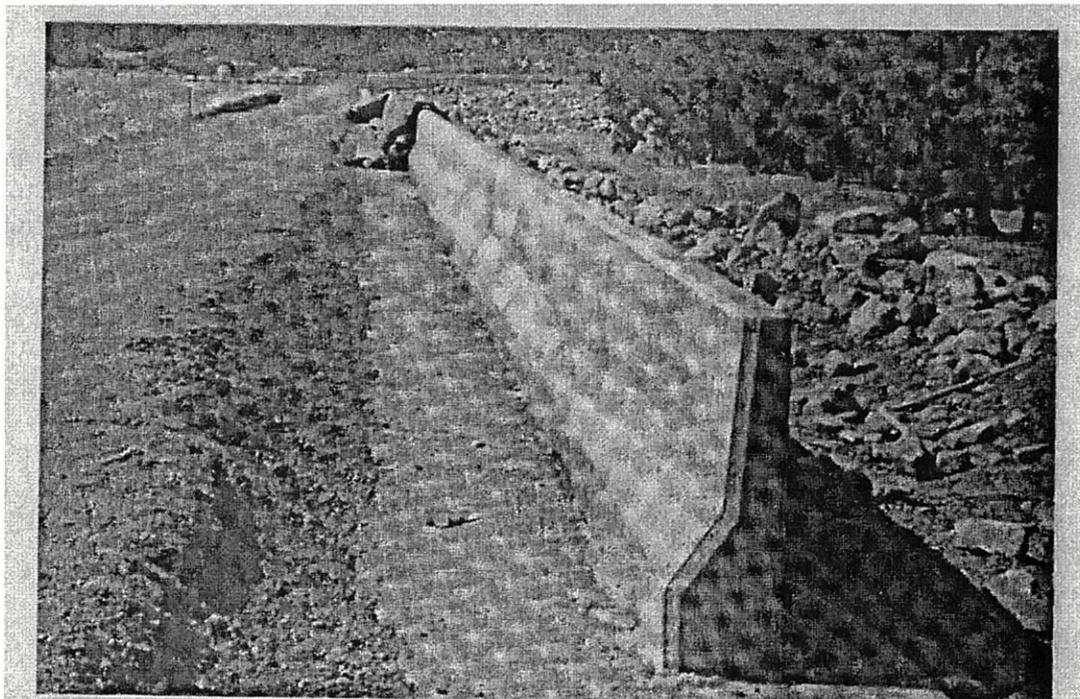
Example of a concrete parapet wall under construction. This wall is approximately three feet high. The parapet walls installed on the rehabilitated dams will be four to five feet high.
